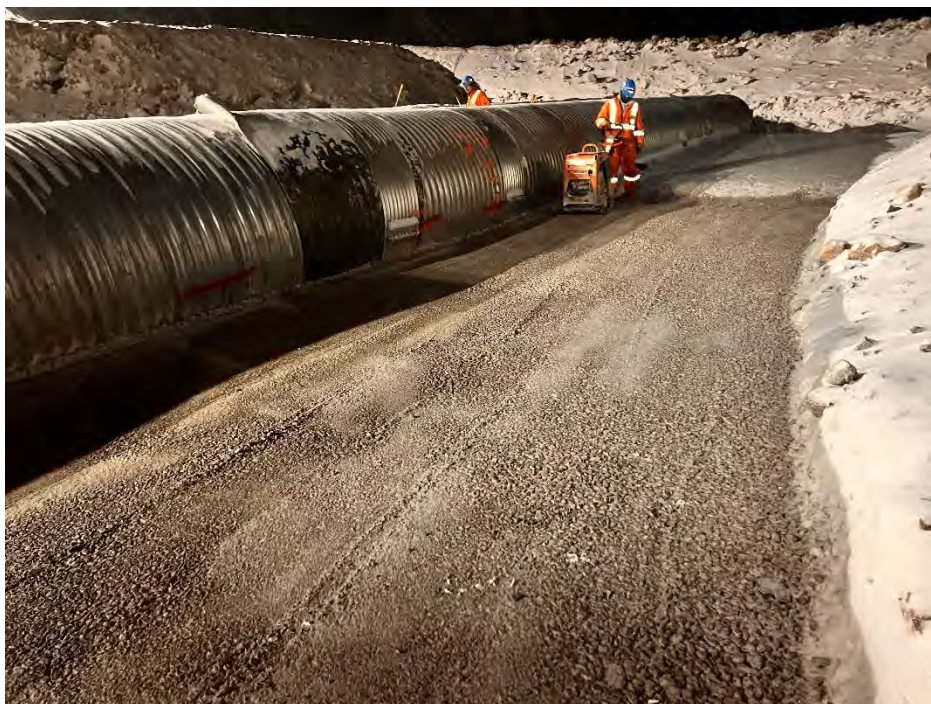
Compaction of 32 mm minus culvert backfill material lift on south side at BG-04. Photo taken March 31, 2024, facing north.
